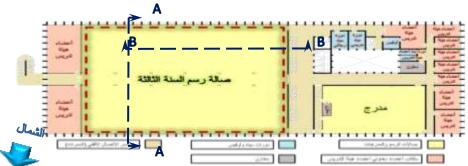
Horizontal skylight of 4th floor of the University. One drawing room are shown.
